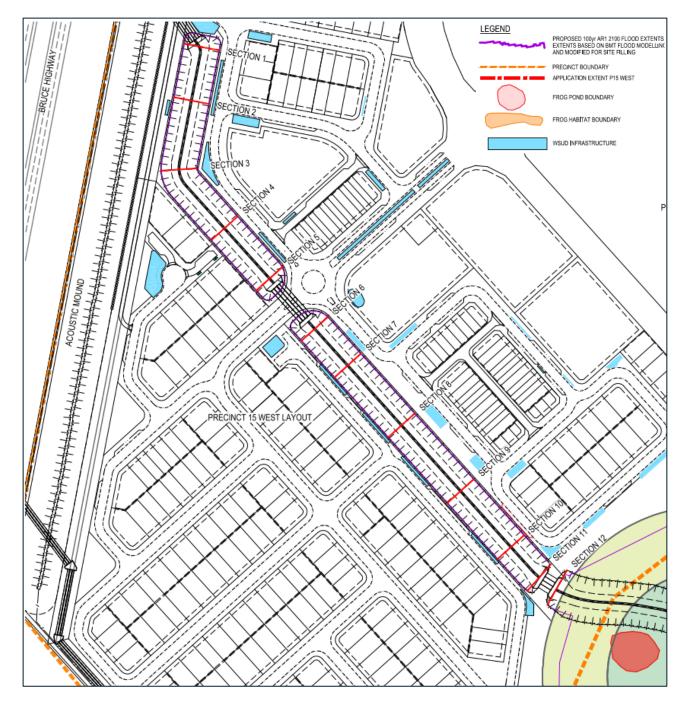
OPEN CHANNEL REPORTING SECTION LOCATIONS PLAN
